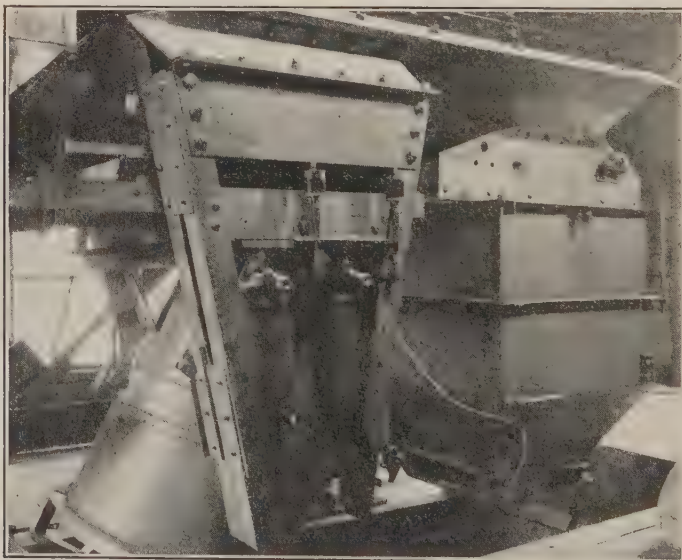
Inundator at the left is just swinging into upright position after discharging.
